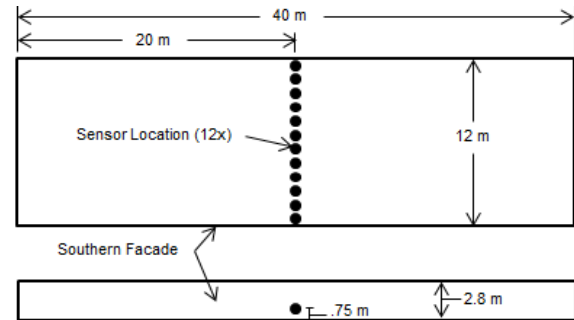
Plan (Top) and Section (Bottom) Views of Model Space with Dimensions
